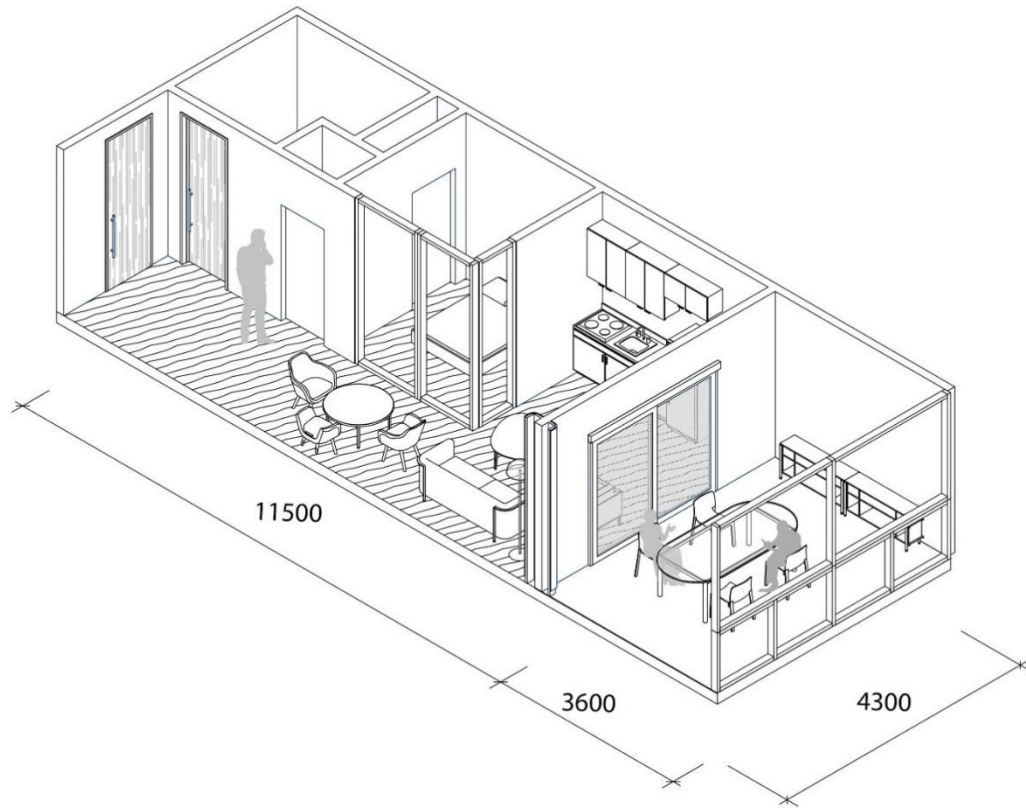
Axonometric section of proposed balcony as dining space, this would require enlarging the balcony space
